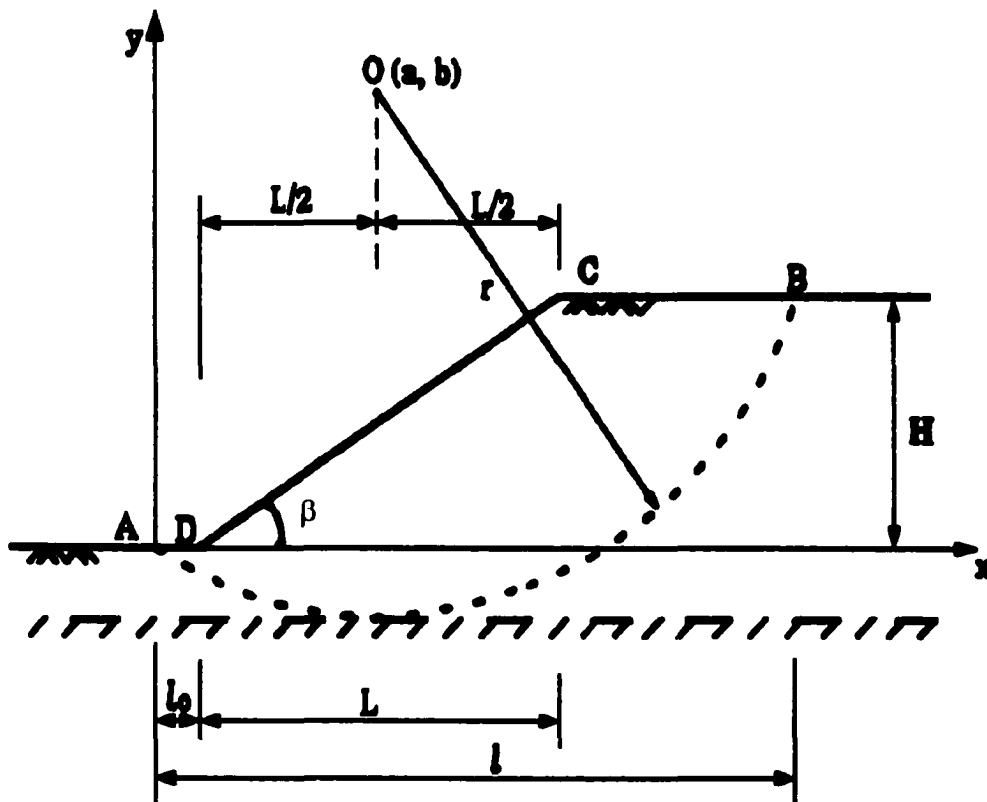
Typical Section for Base Failure Slope (Cao and Zaman, 1999)
